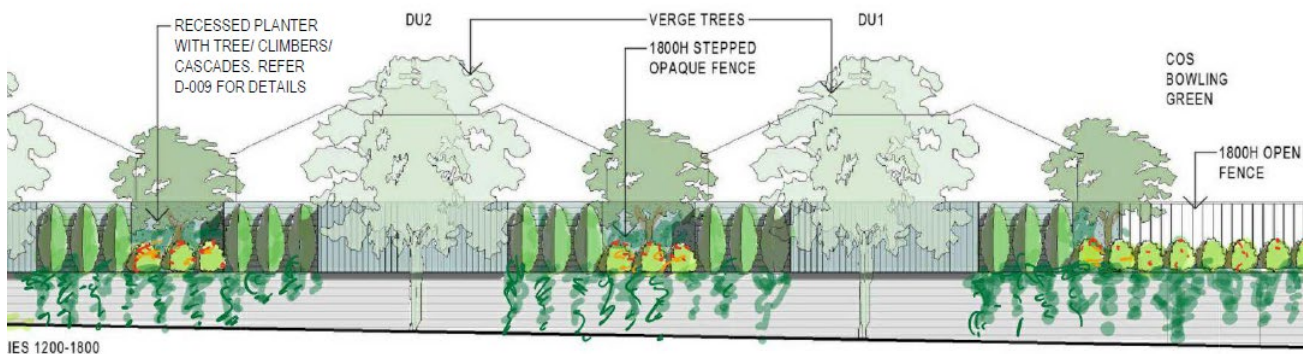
Swansea Road Interface showing Communal Open Space Linkages
